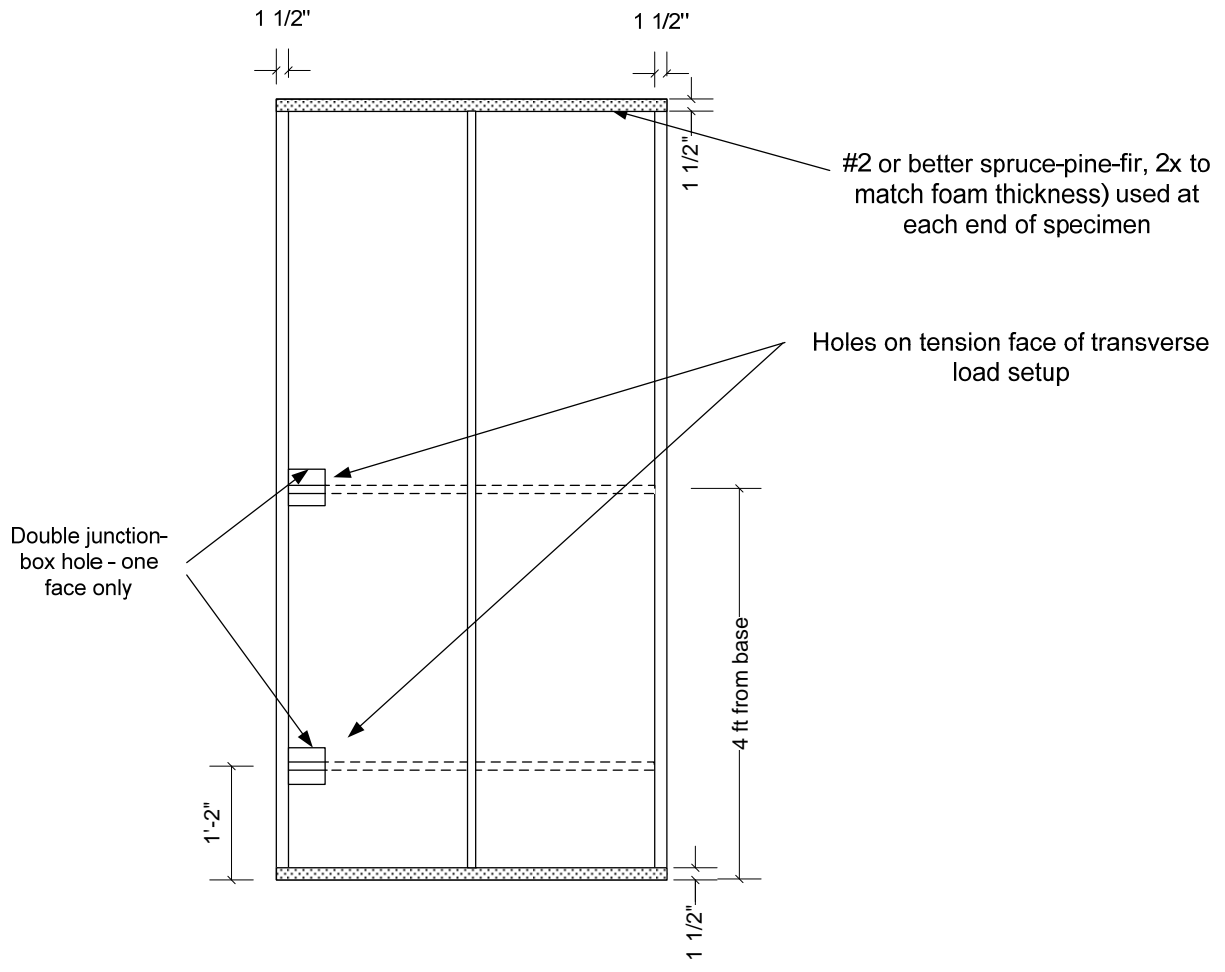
TRANSVERSE LOAD TEST SPECIMEN AND ASSEMBLY
